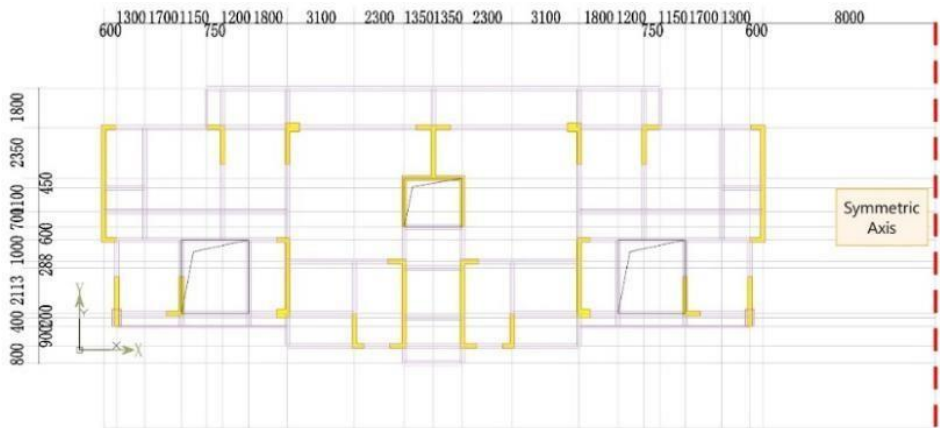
Half plan view of the towers for Model 1 (level 3 to 12) [26]
